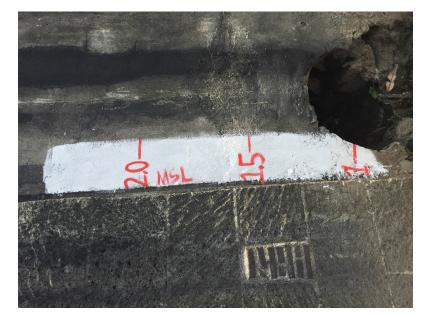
Water level markings on the side of the pier of the Zapote Bridge
